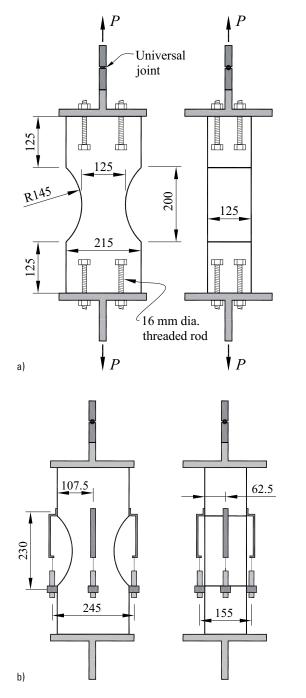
Details of uniaxial tension test specimens: a) specimen dimensions, b) displacement transducer locations
